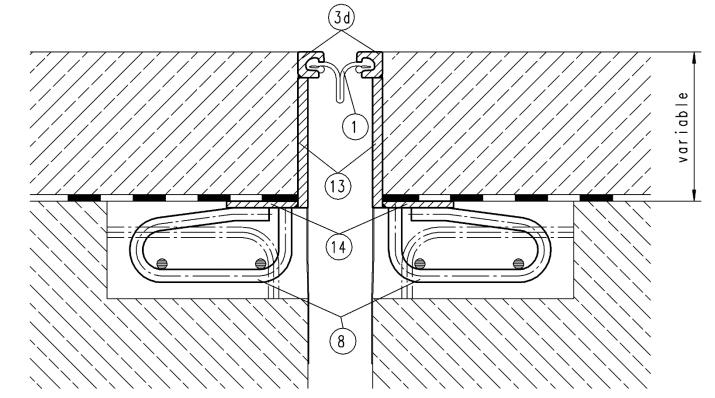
Exemplary cross section of the nosing expansion joint MAURER XC1 Expansion Joint with edge profile D1/40, including anchorage, variable pavement thickness for footpath
